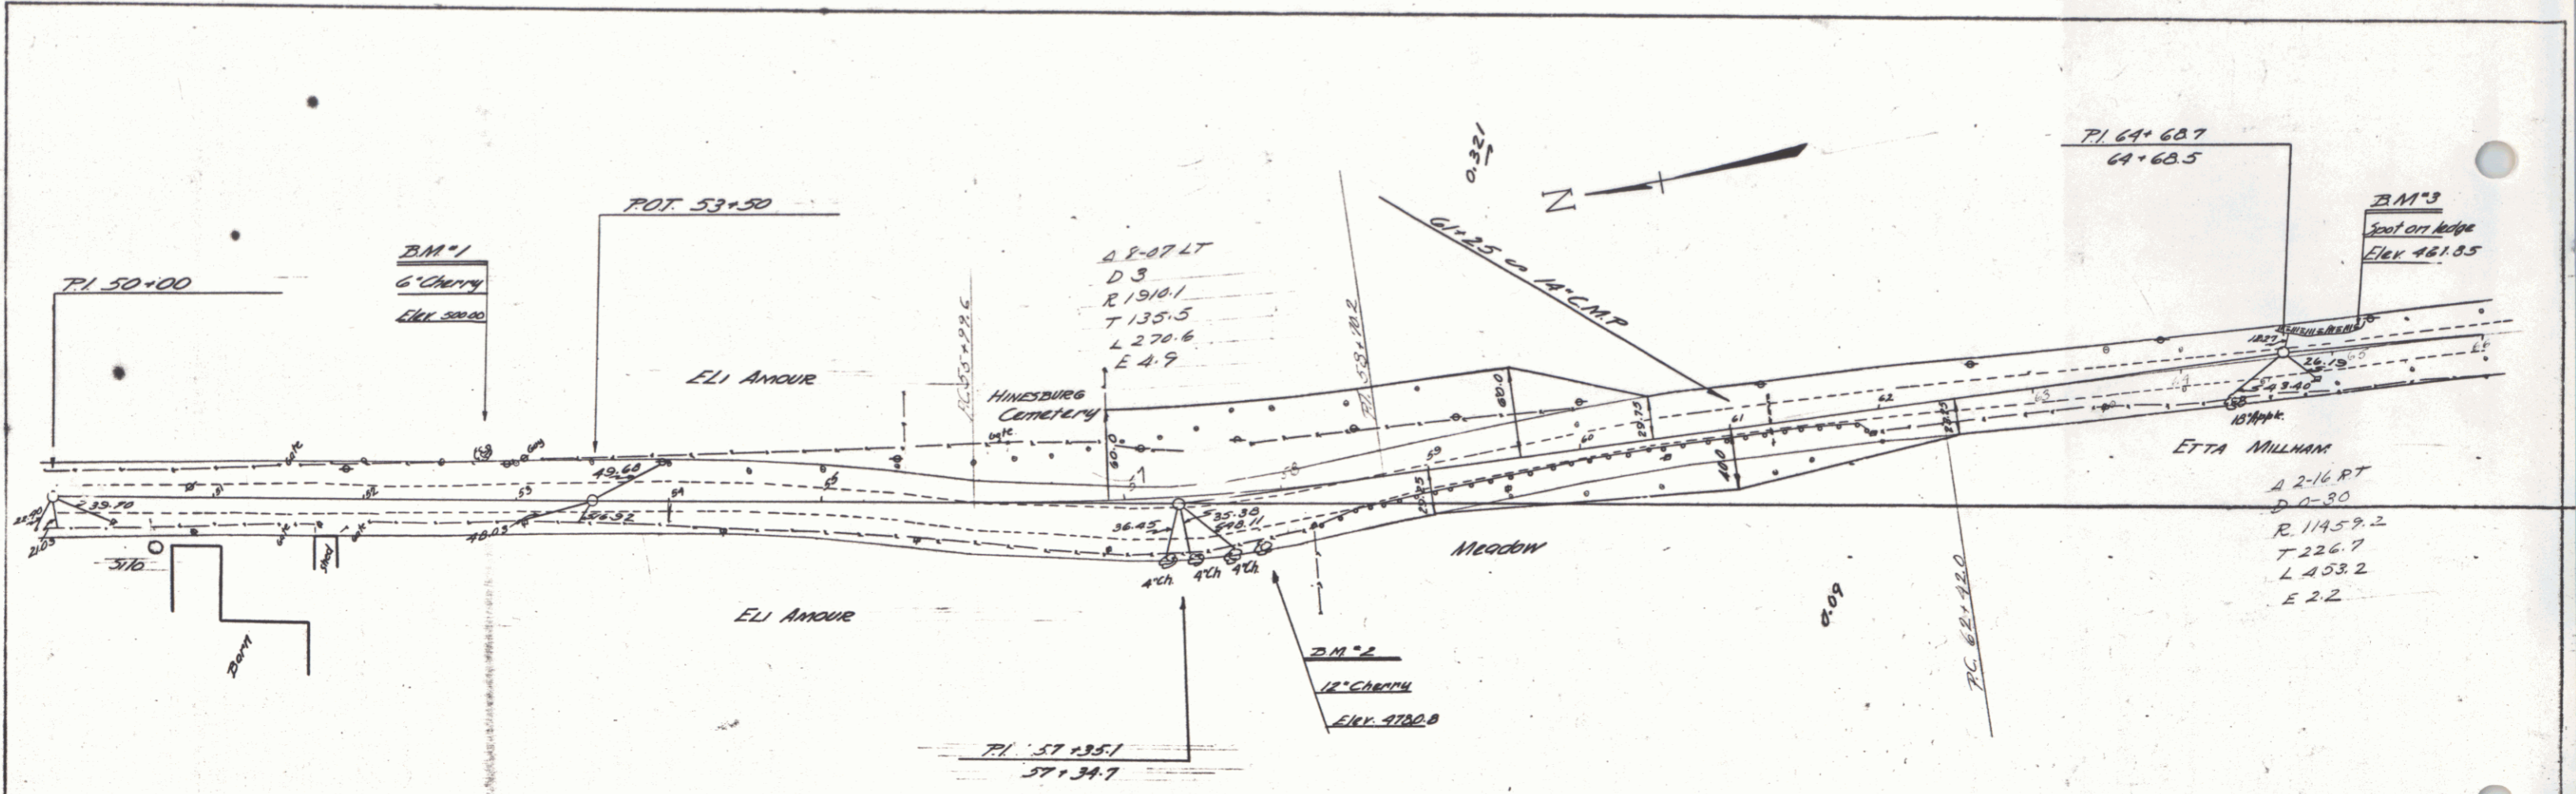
PLATE - PLAN PROFILE - P.A. & L. BRIDGE
